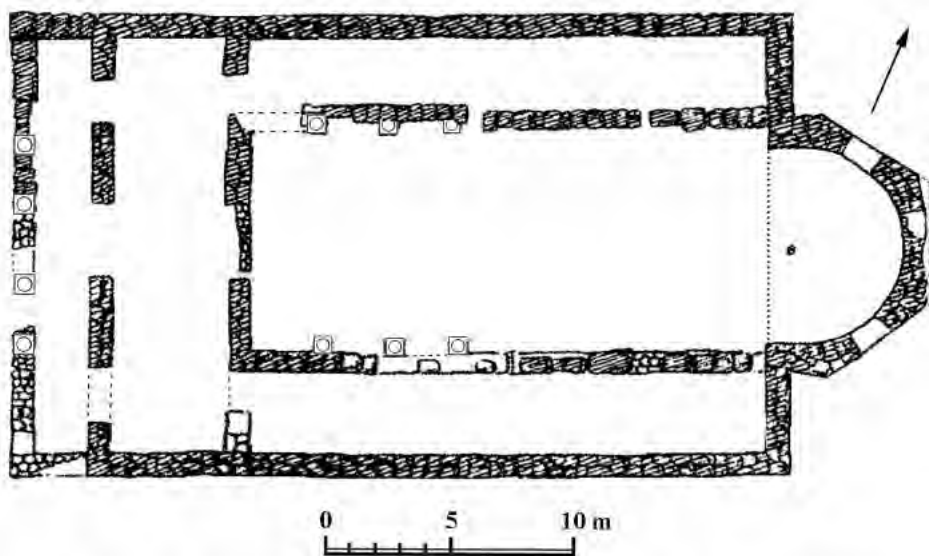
Church No. 36, "East Basilica". Excavation Plan (after K. Grinevich [117, pl. 1]).
